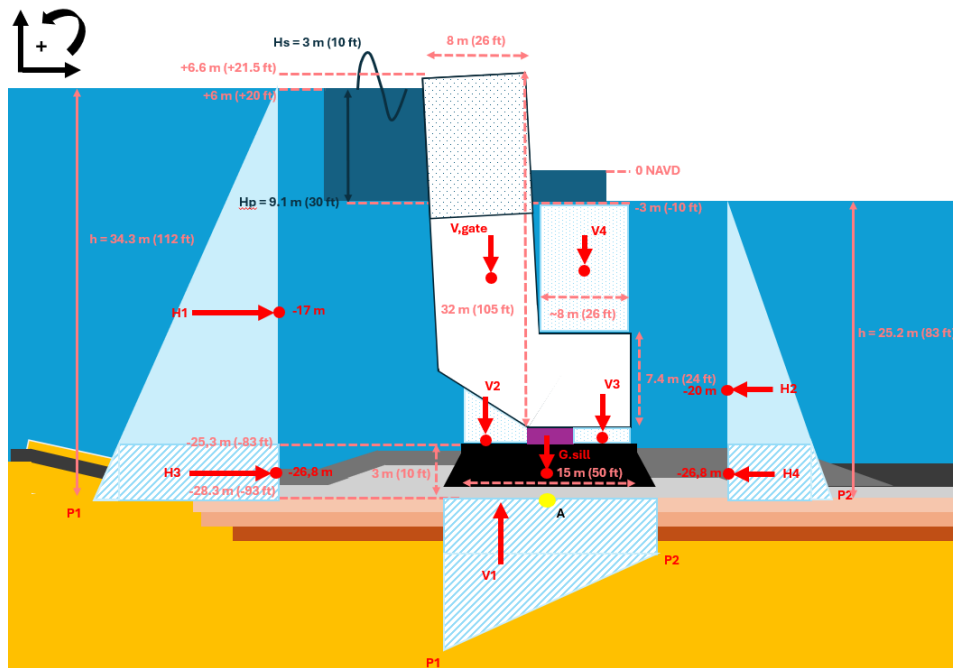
Schematic forces – Alternative 2 without caisson: closed barrier (governing case).
